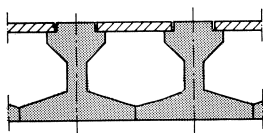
Part of cross-section through a hollow bridge deck. In winter the cavities between the precast beams became filled with water and ice, causing the small cover slabs to be forced off.
